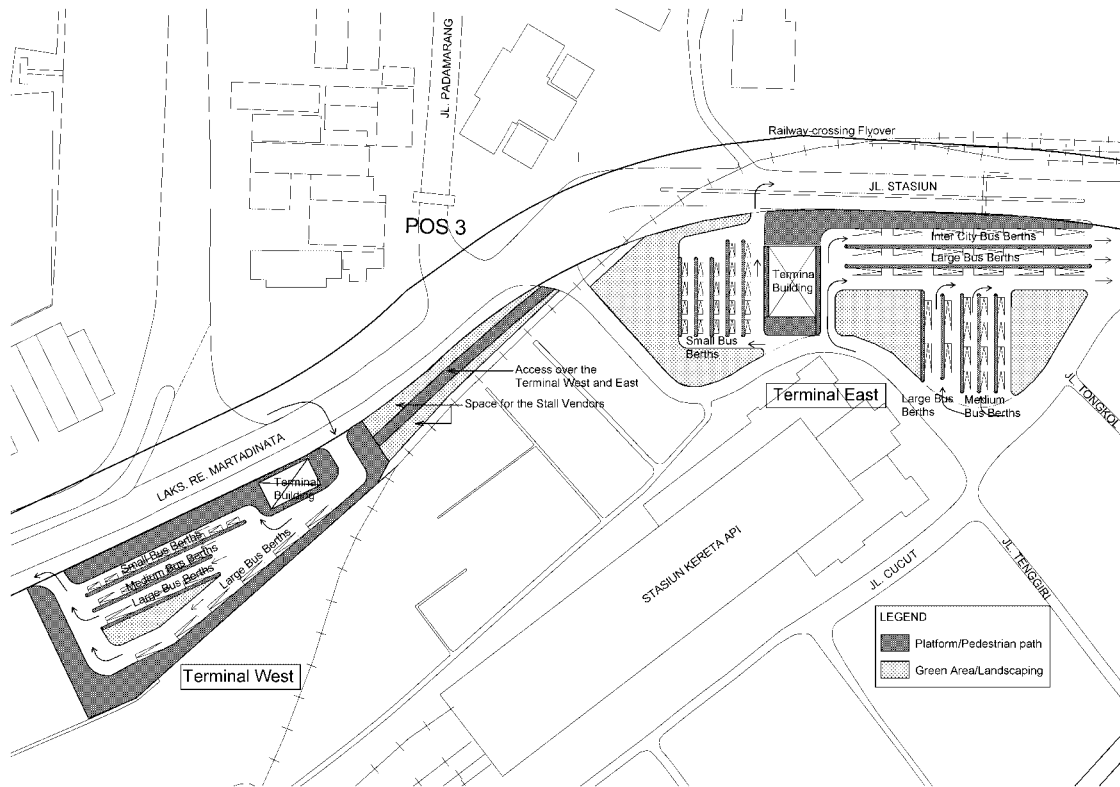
B-11 Proposed Layout Plan for the Alternative-2
